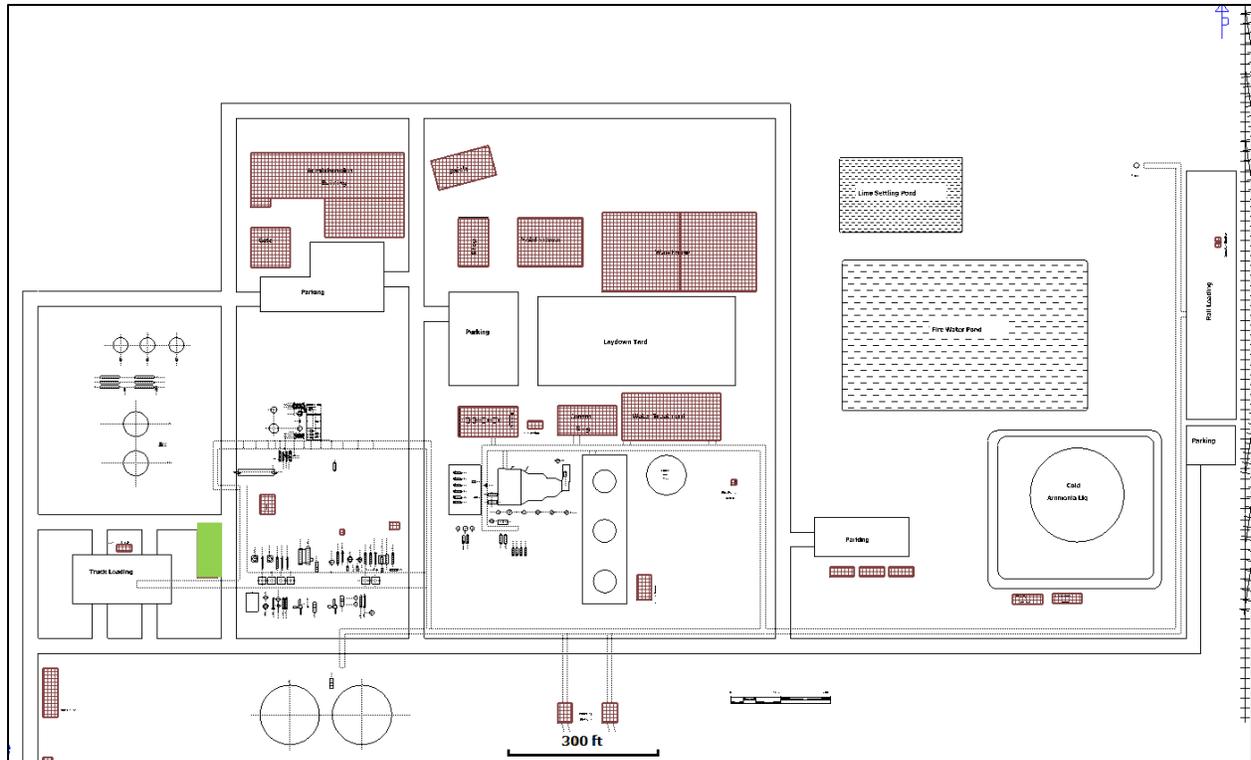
Facility Plant Plot Plan (Building Location Shown in Green)
